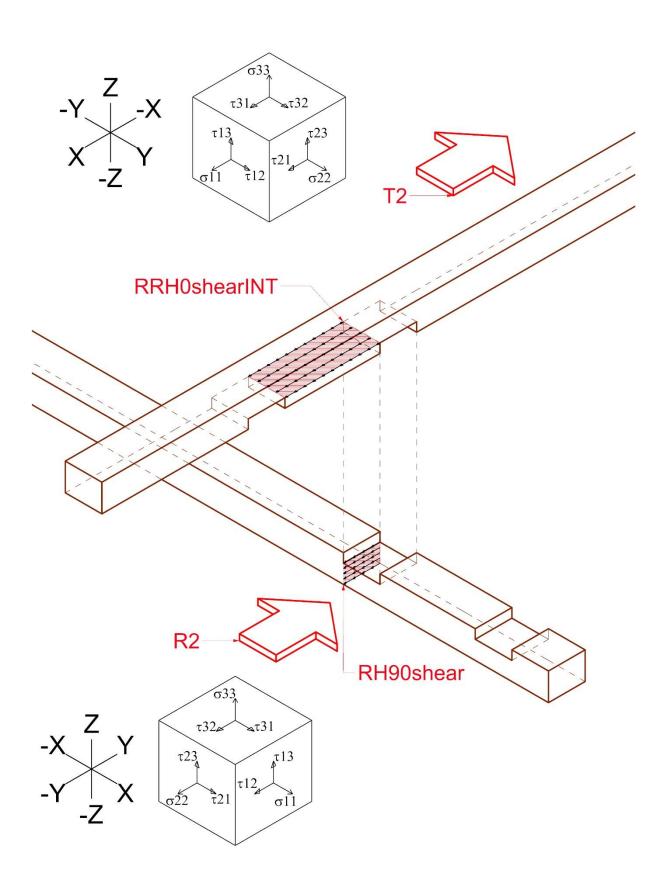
Roof Rafter Head Tangential stresses: Crossing rafters T2-R2
